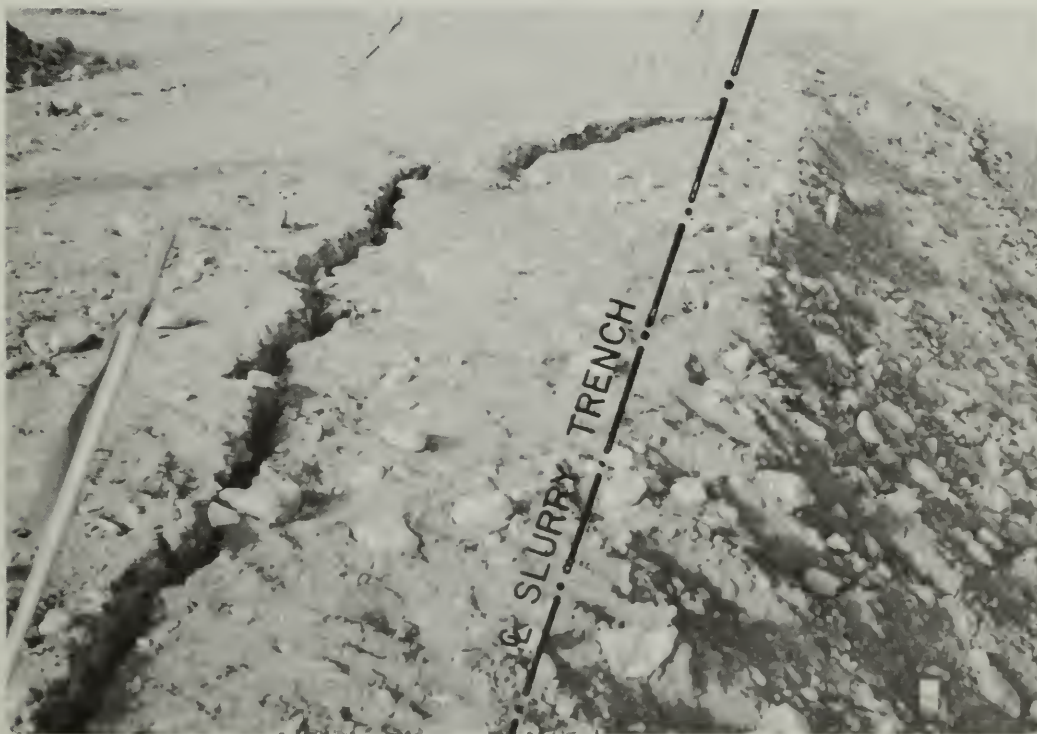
Settlement cracks over the slurry trench after the winter shut down.
